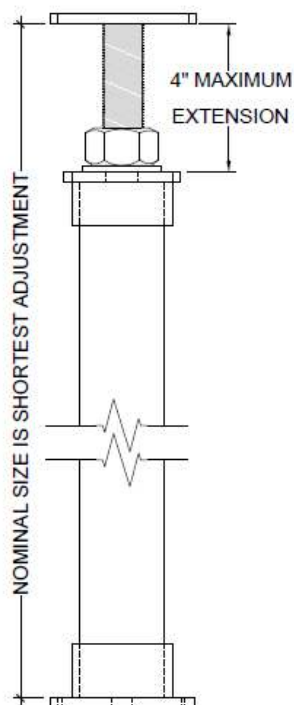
OVERALL SETTLESTOP FLOOR SUPPORT COLUMN ASSEMBLY
